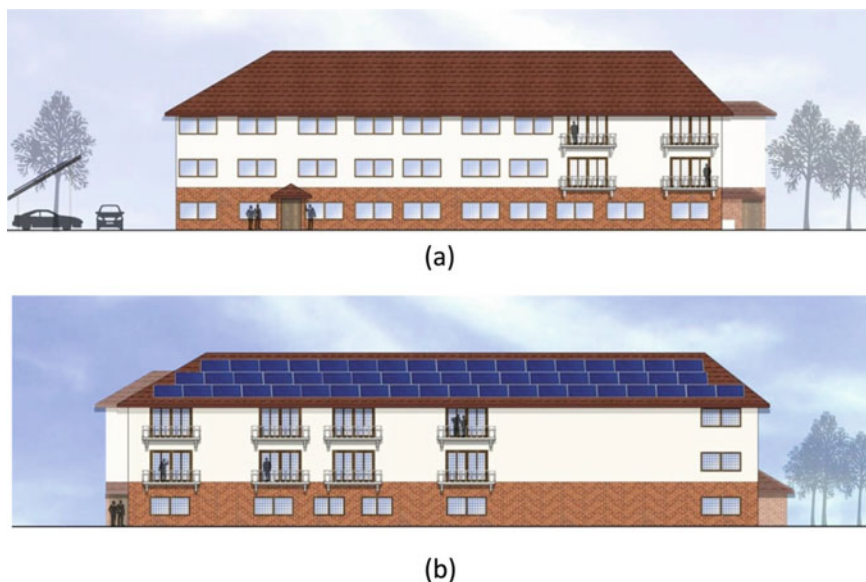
Revised elevations to match local architectural style and to fit better with the neighborhood. a Shows hipped roofs, added balconies, new windows, and brick and stucco façade; b shows the southwest elevation with solar panels on the roof
